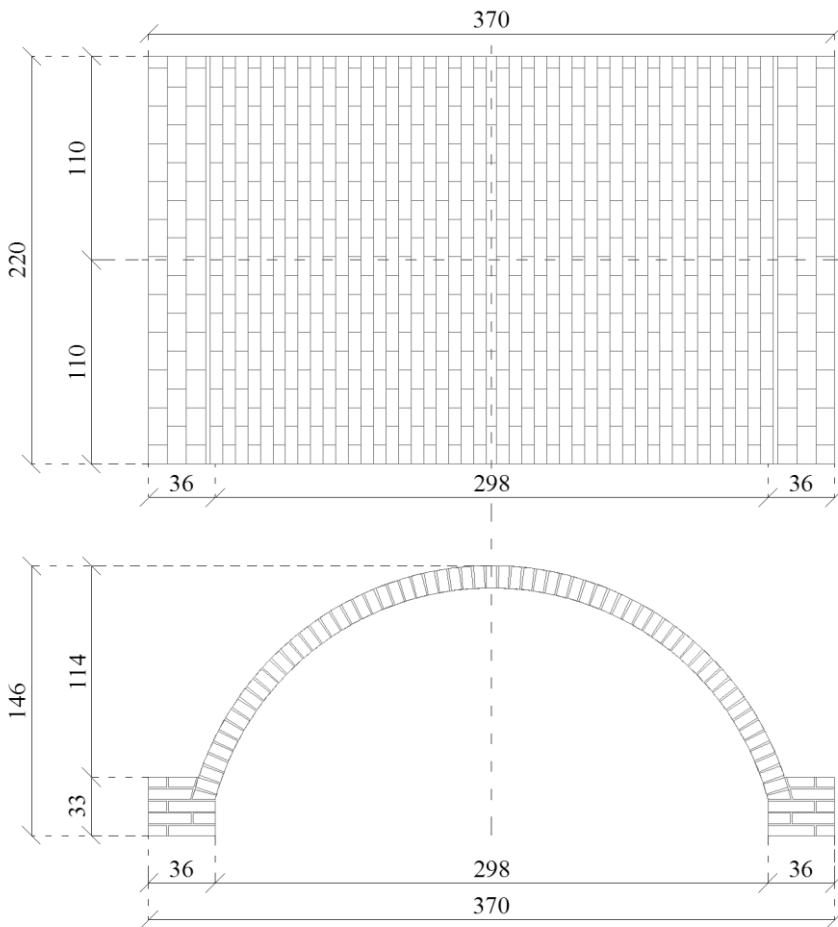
Geometry of the specimen: plan and section views (dimension in cm)
